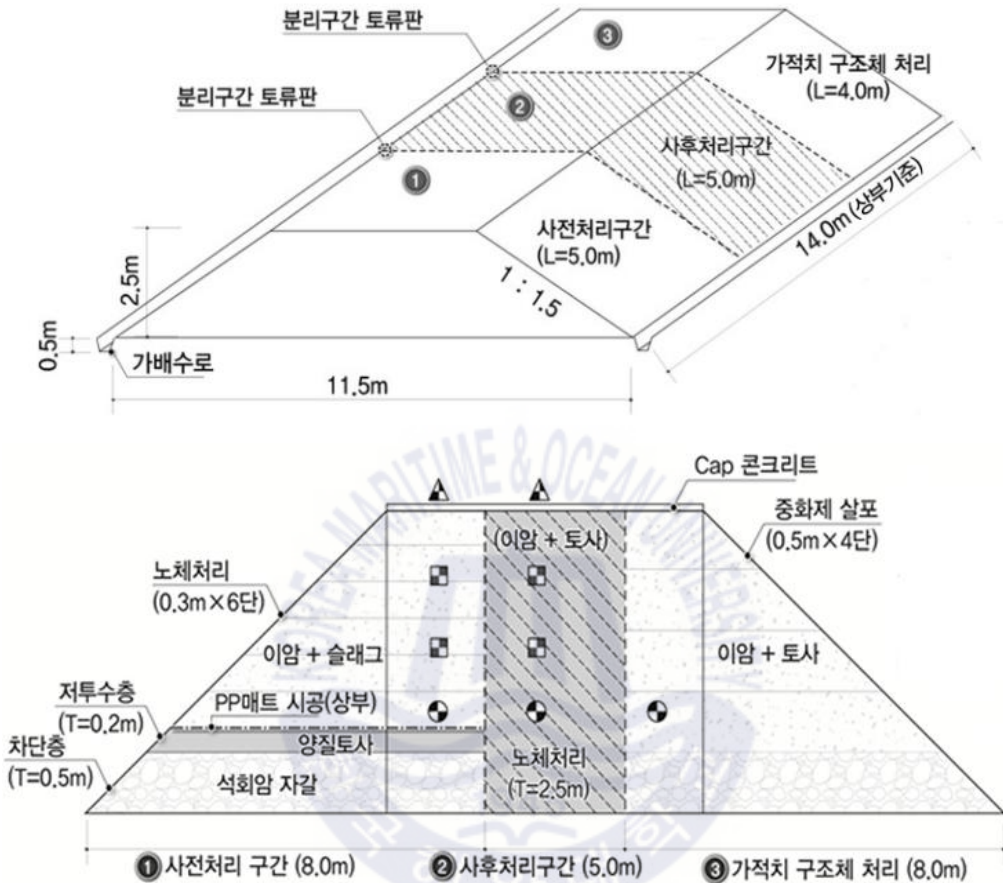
Detail drawing of banking structure field test (Cha et al., 2018)
